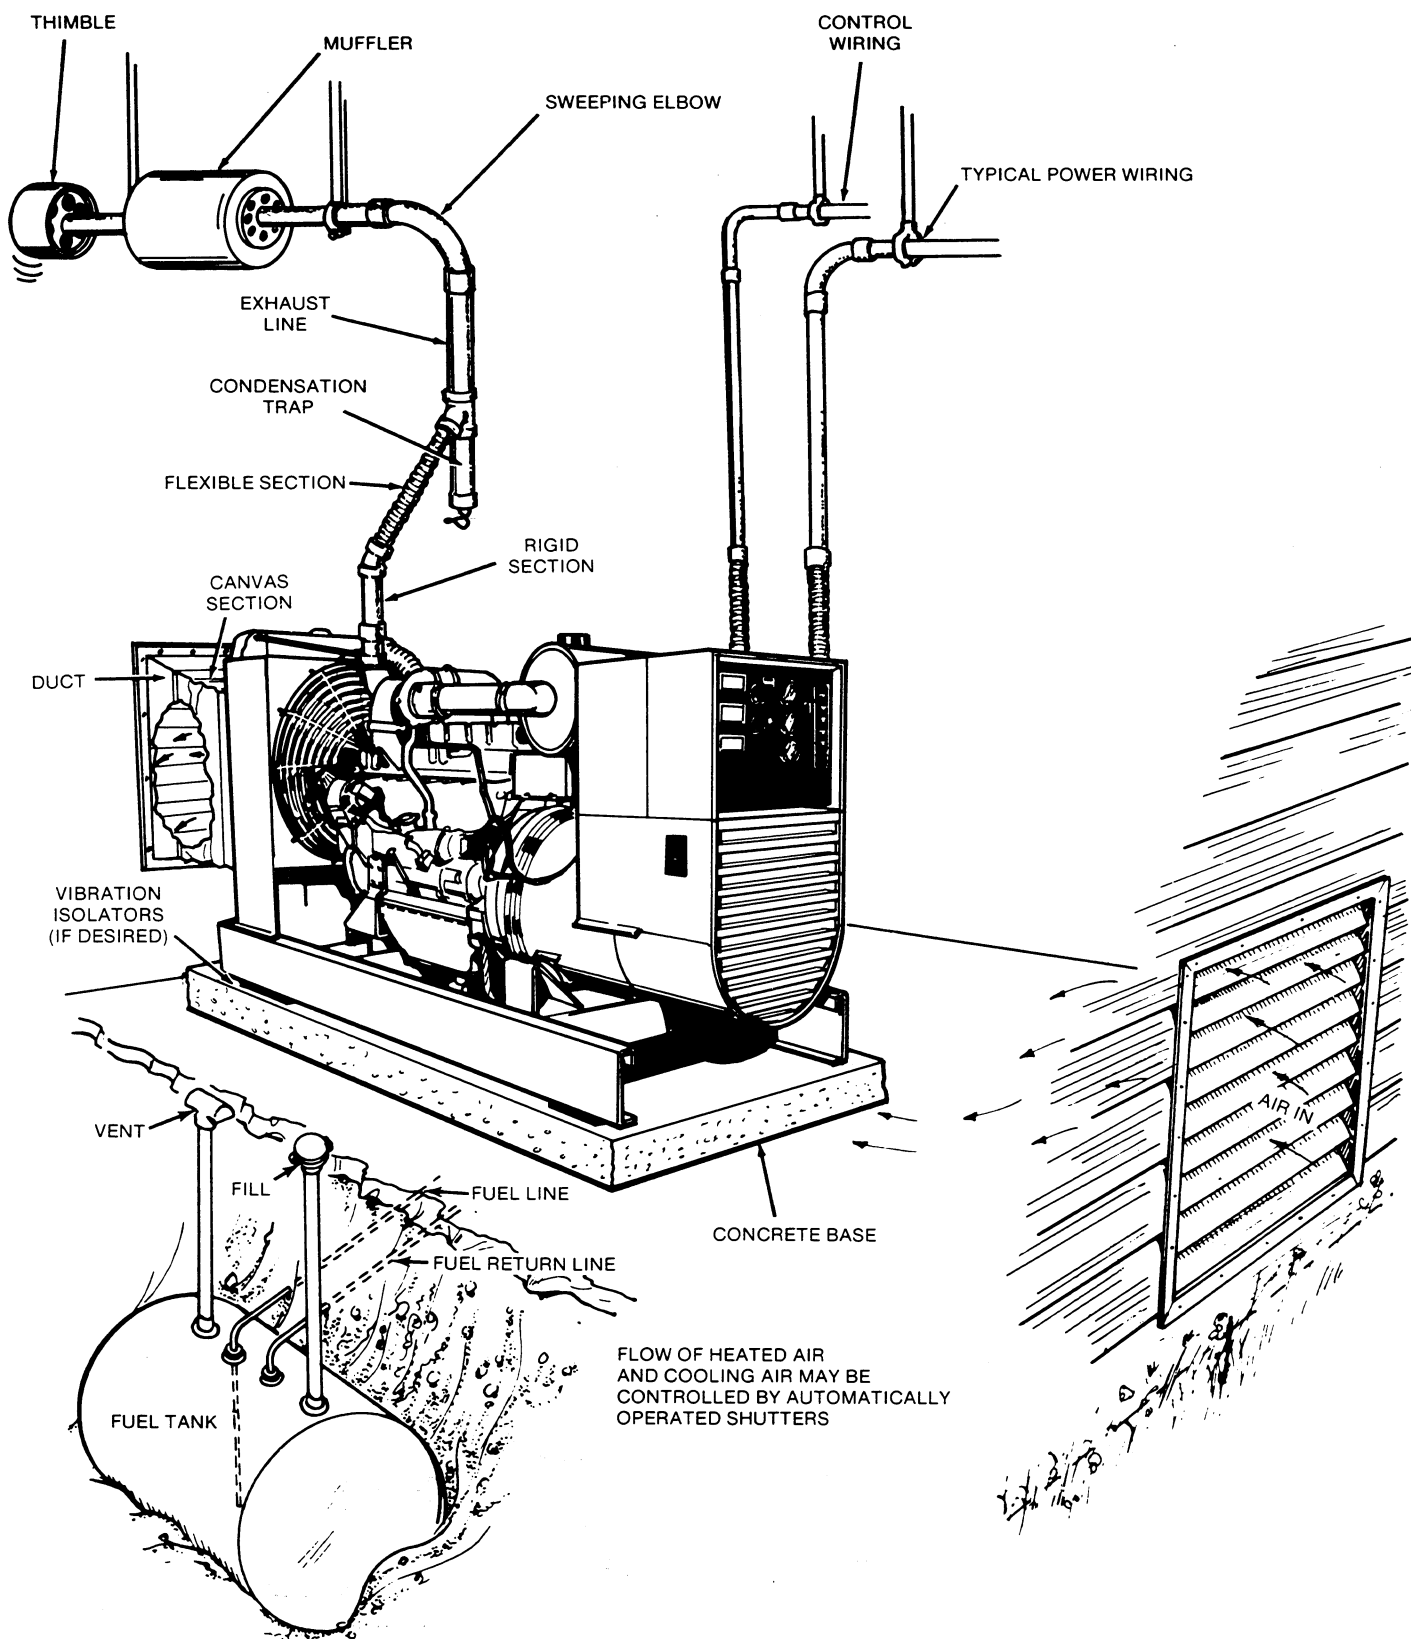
TYPICAL DV GENERATOR SET INSTALLATION
